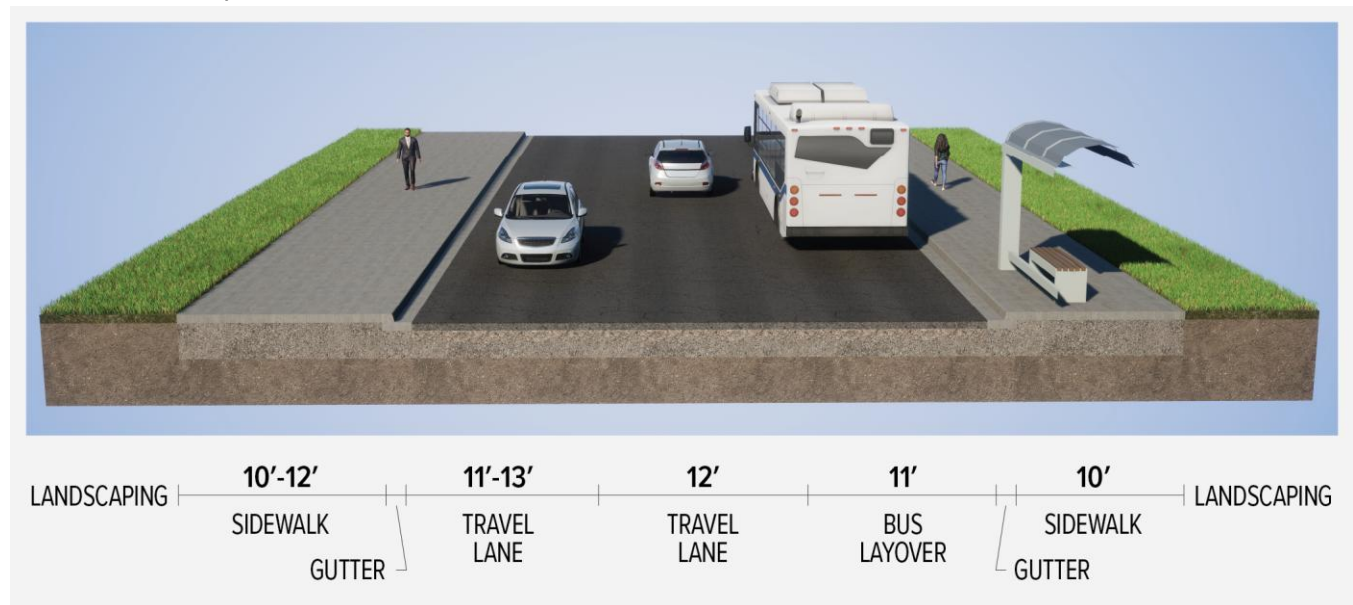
CROSS-SECTION OF HAWTHORNE AVENUE BETWEEN 3RD AND 4TH STREET
